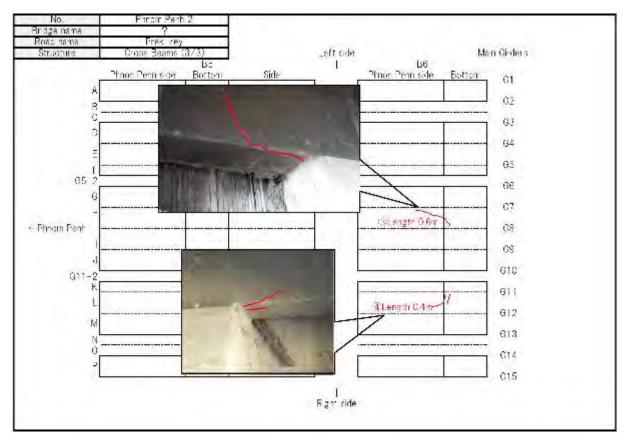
Inspection Sheet (Prek jrey: Phnom Penh. Bridge No. 2)
